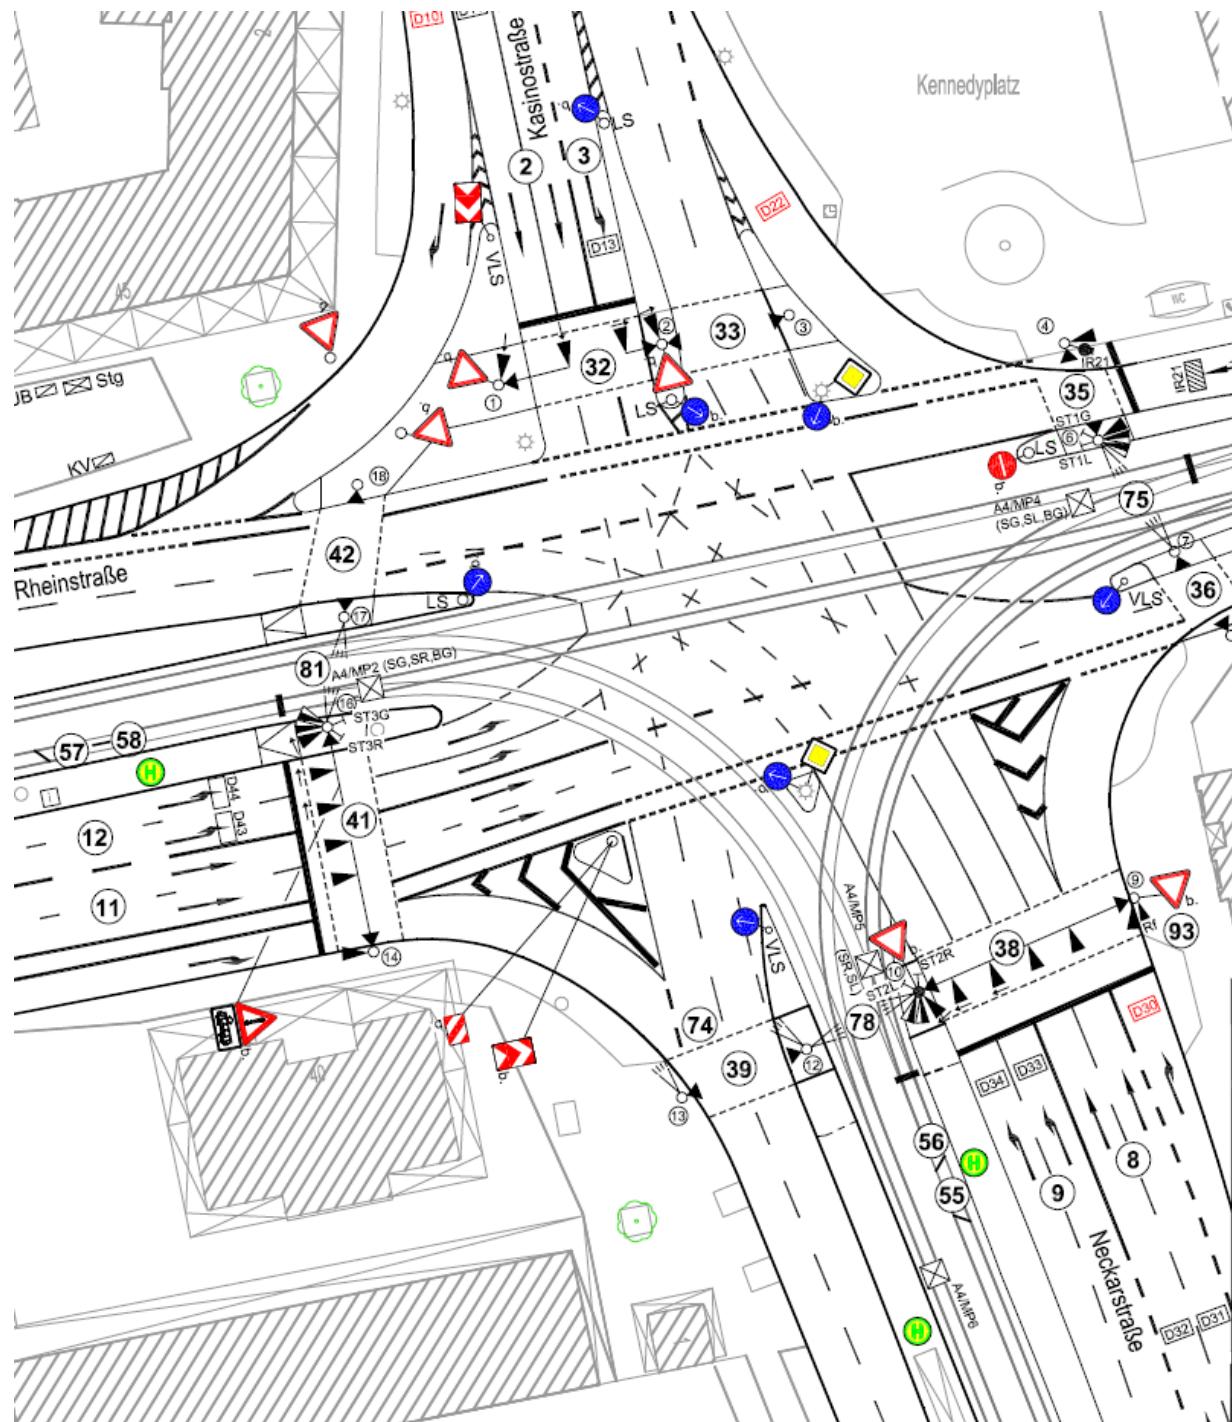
Junction layout of A4 intersection, Darmstadt (Source: Darmstadt Town hall)
